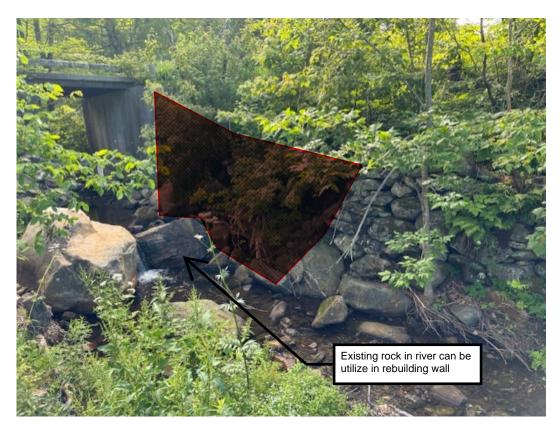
Looking at damaged wingwall from opposite bank
